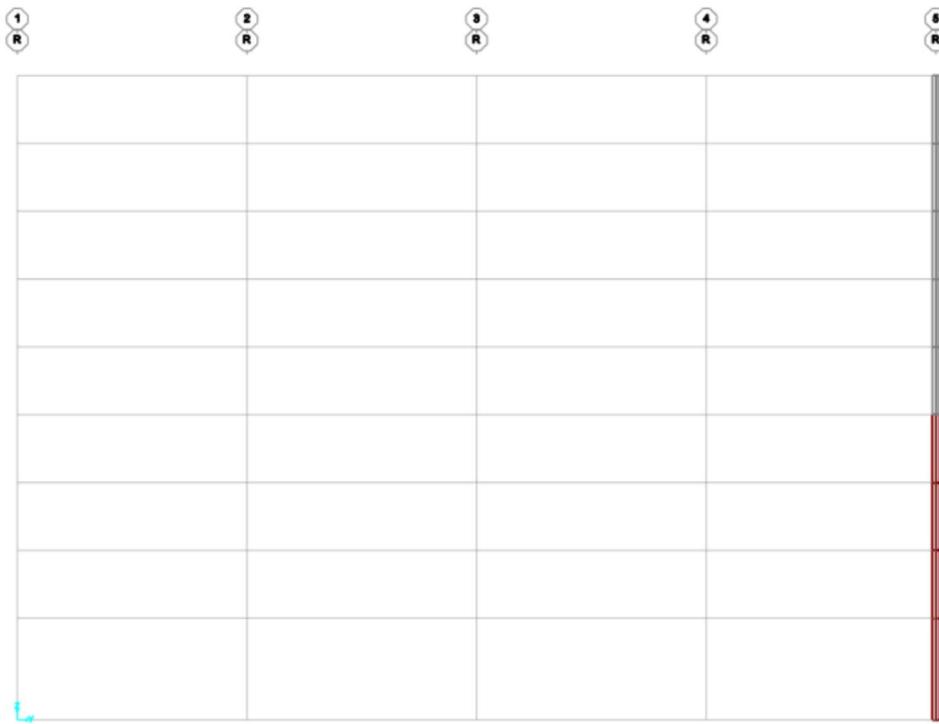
Column cross-section layout in the face R (SAP2000)
